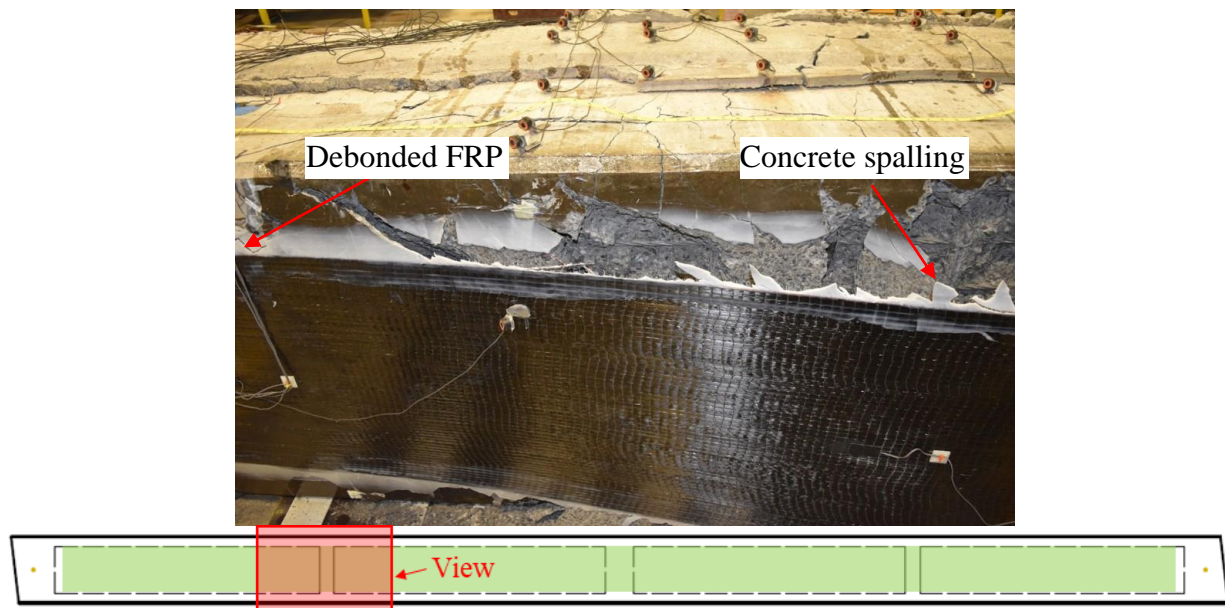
Transitioning from FRP debonding to concrete spalling at the West actuator location
